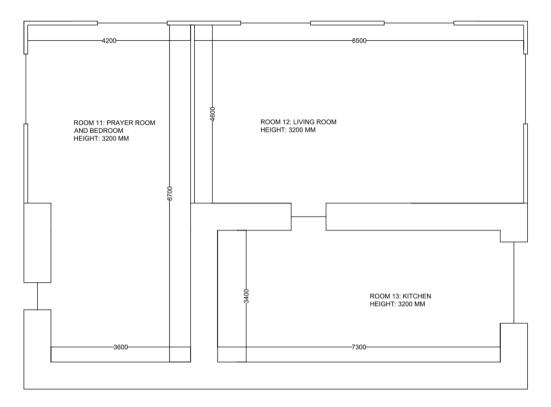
Floor plan top floor, bedroom, living room and kitchen, dimensions in millimetres
